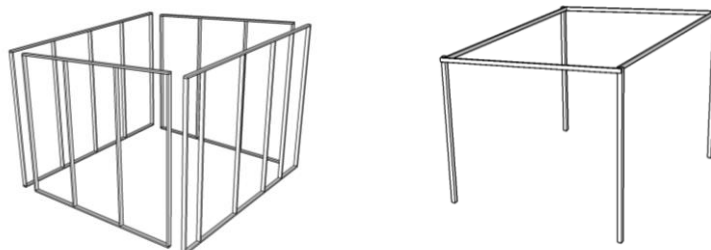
The two building methods compared. Left the prefab load-bearing construction and on the right the self-build load-bearing construction (Own image)
